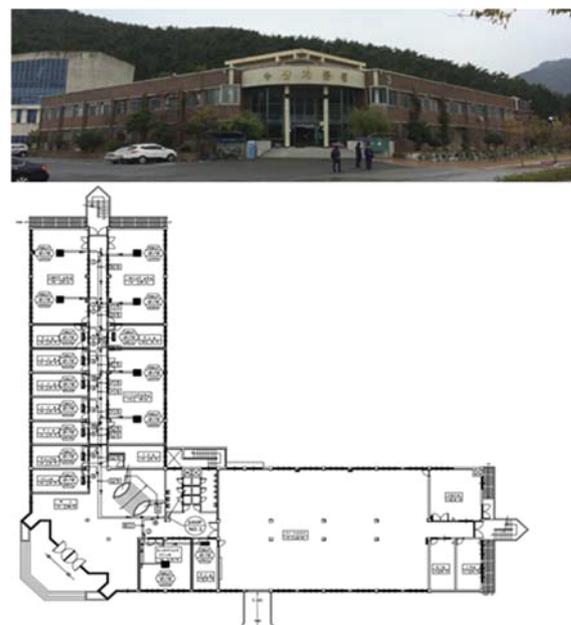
Exterior of the building (top) and 1<sup>st</sup> floor plan (bottom)
